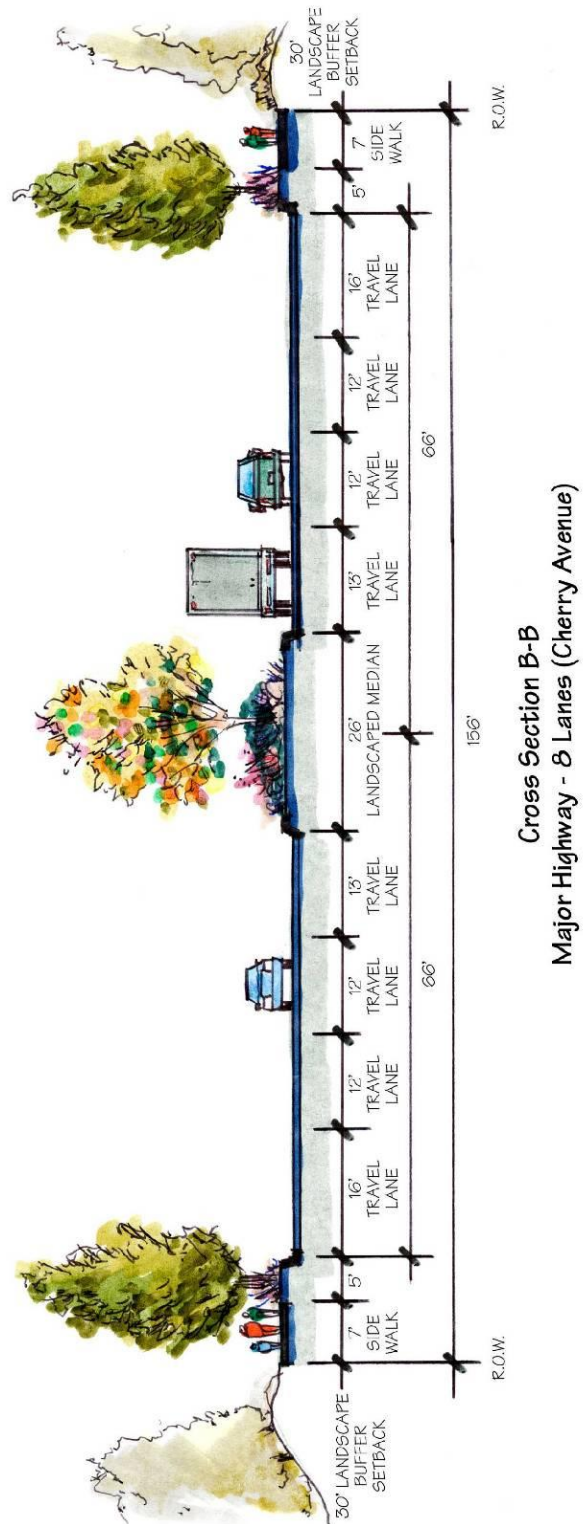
Major Highway – 8 Lanes – Cross-Section B-B (Cherry Avenue)
